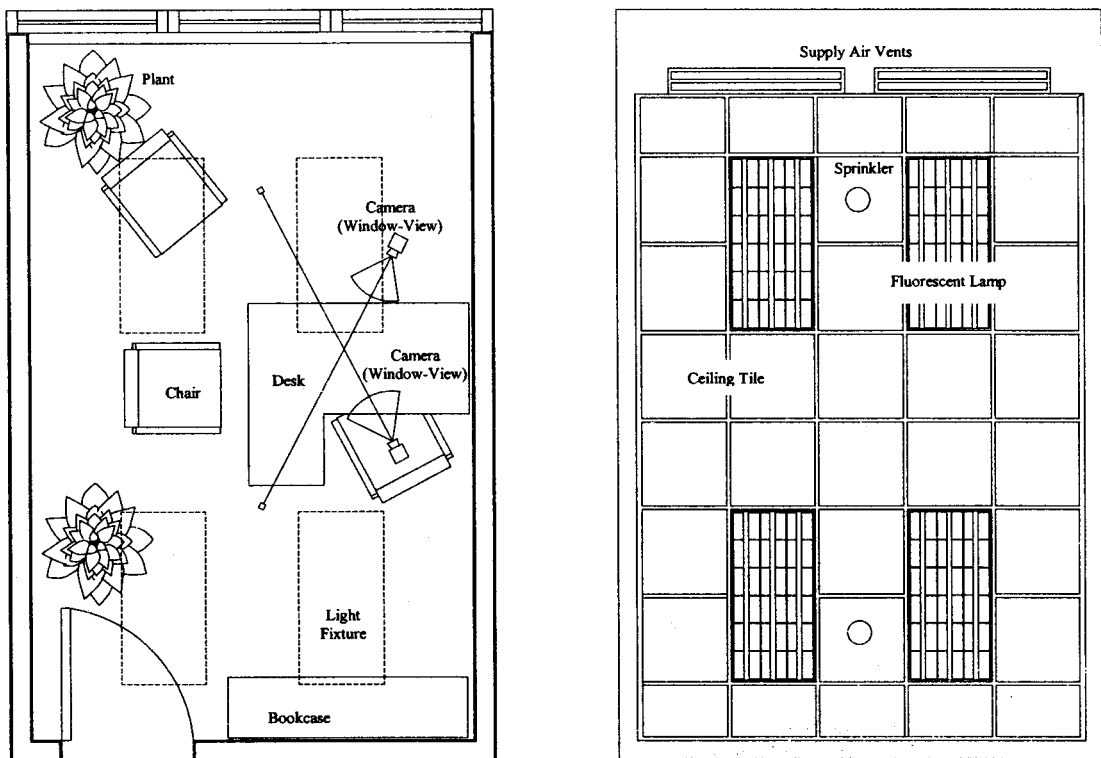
Floor Plan and Reflected Ceiling Plan of a Typical Office Space
